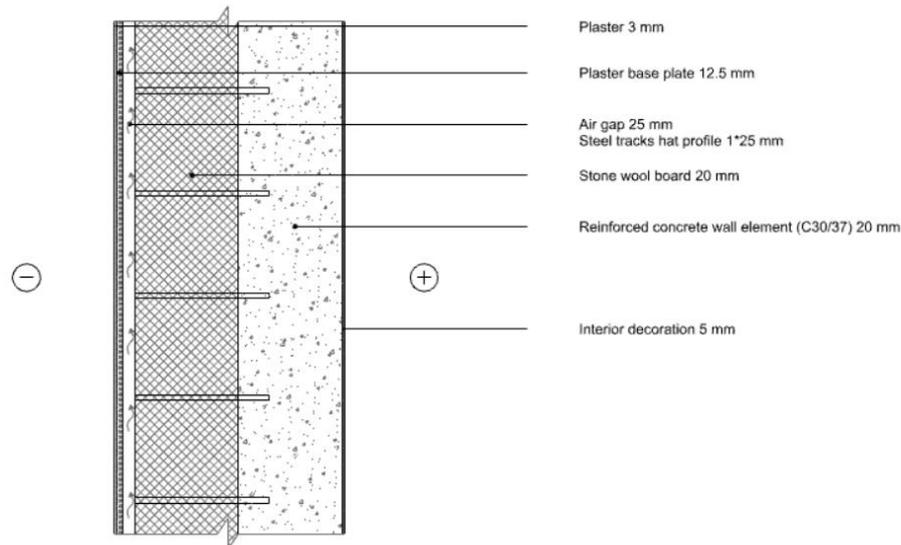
Details of layers of Reinforced Concrete Wall (V1)
